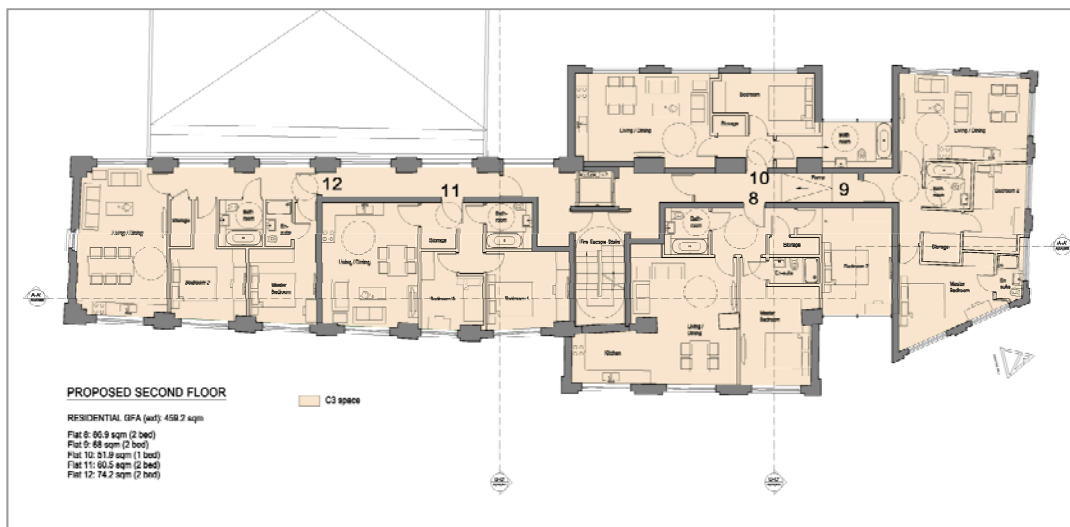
Proposed Second Floor - 2019 (Contemporary Design Solutions)
